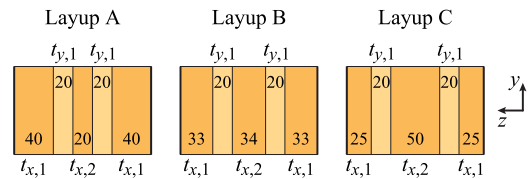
CLT element layouts A, B and C, with layer thicknesses in mm.
